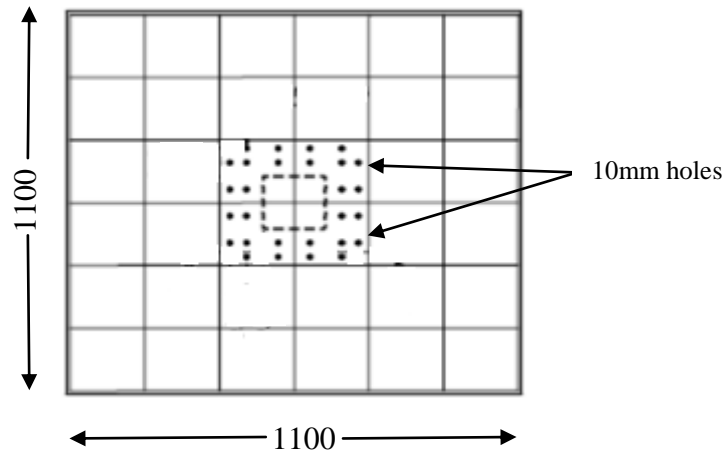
CFRP and GFRP stirrups Arrangement (Spacing between stirrups = 40mm)
